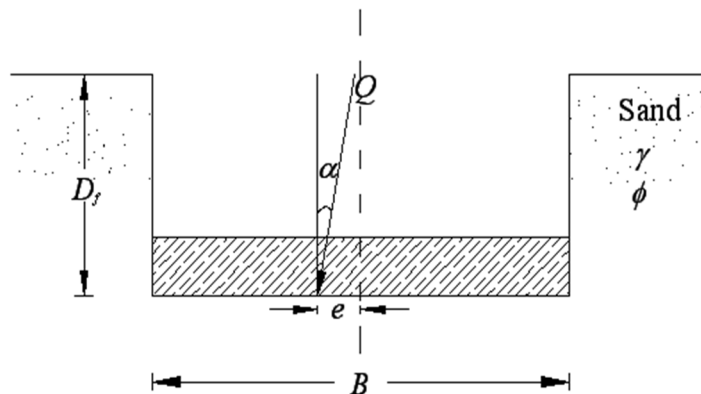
Eccentrically inclined load on strip foundation: line of load application towards the center line of the footing
